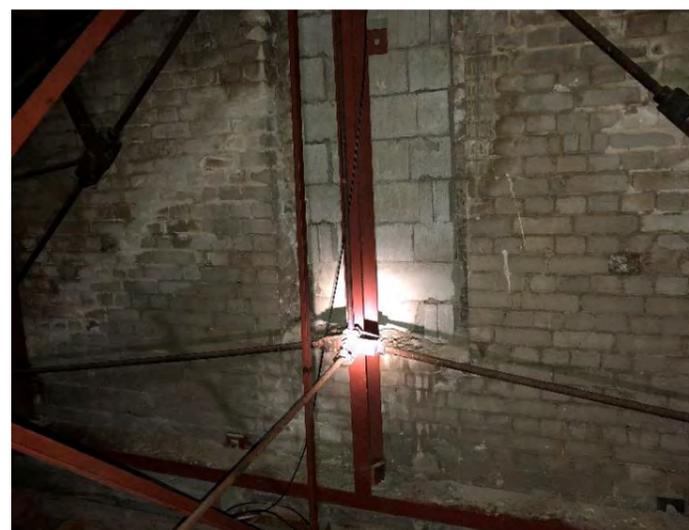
East Gable front element strengthening girt has no effect on outwards movement as no fixing to wall and only at one location.
